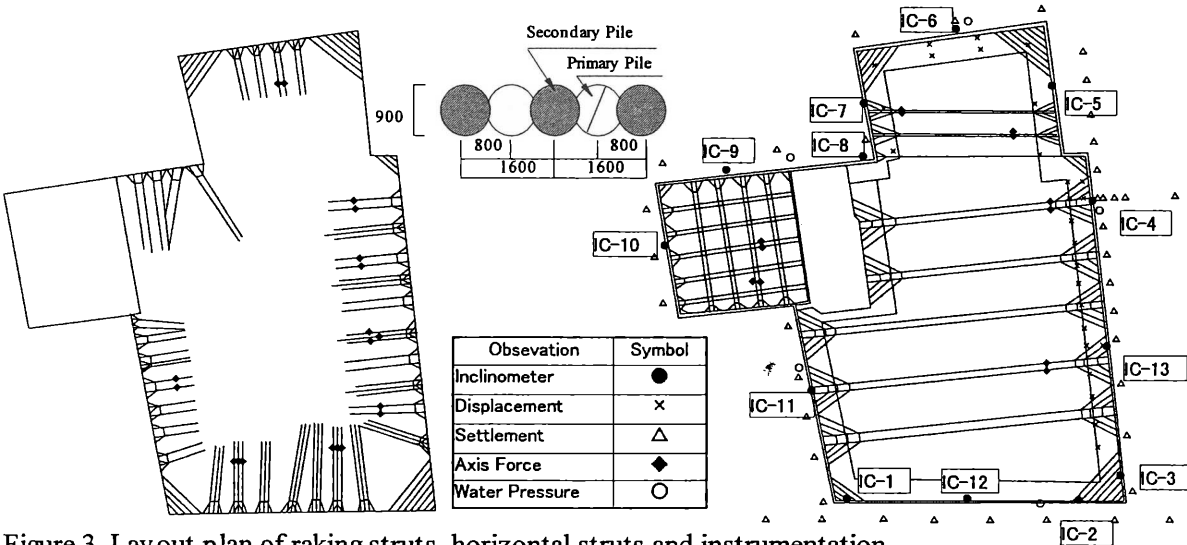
Lay out plan of raking struts, horizontal struts and instrumentation.
